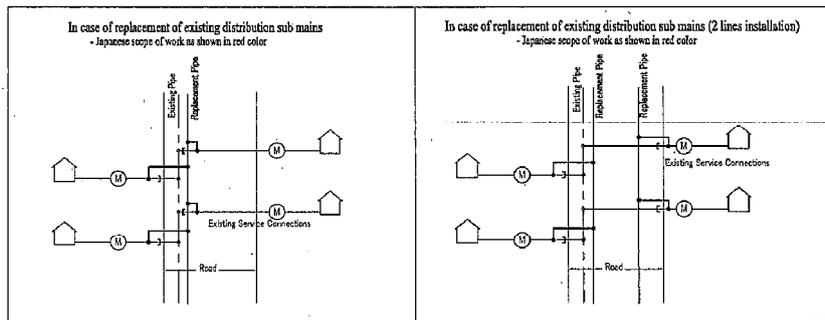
Existing Distribution Submain Construction (Replacement)
